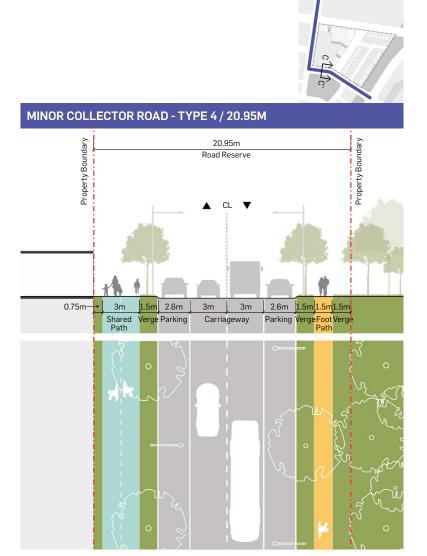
Indicative Street Section C-C' - Minor Collector Road - Type 4
